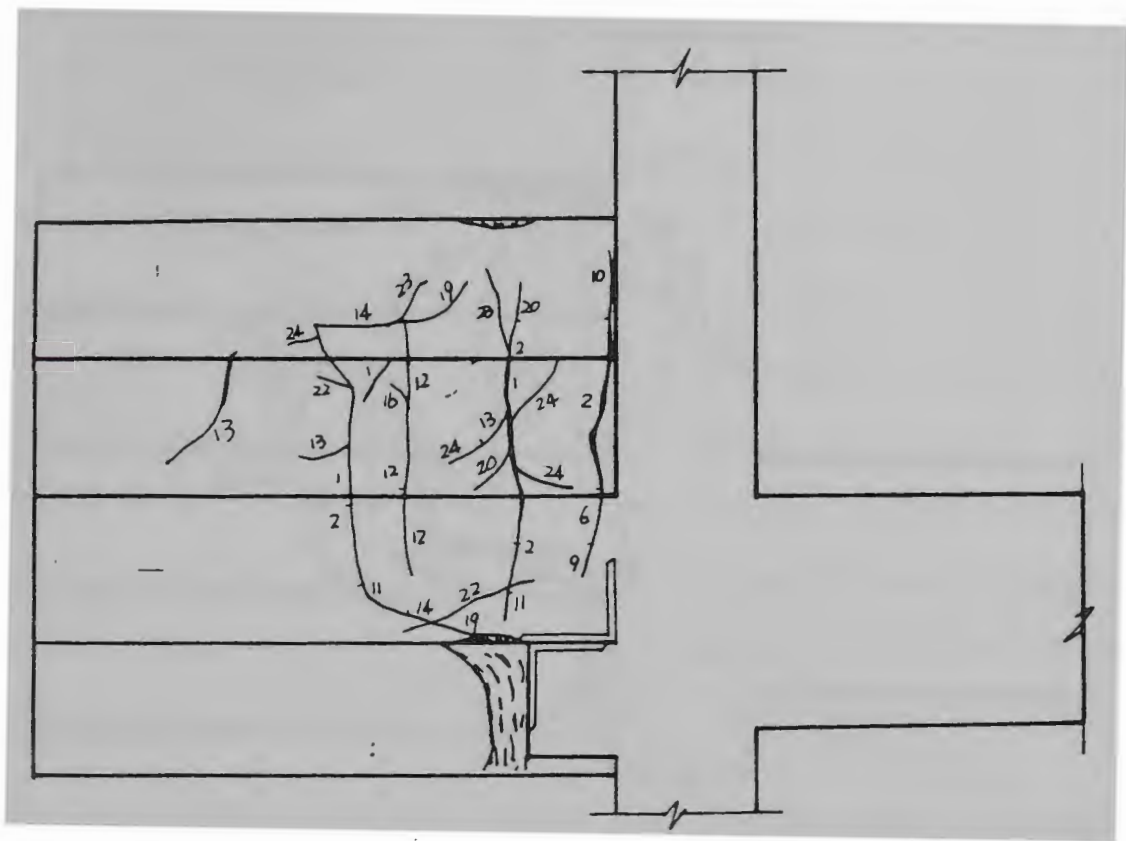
Crack Pattern for Specimen RPB1
